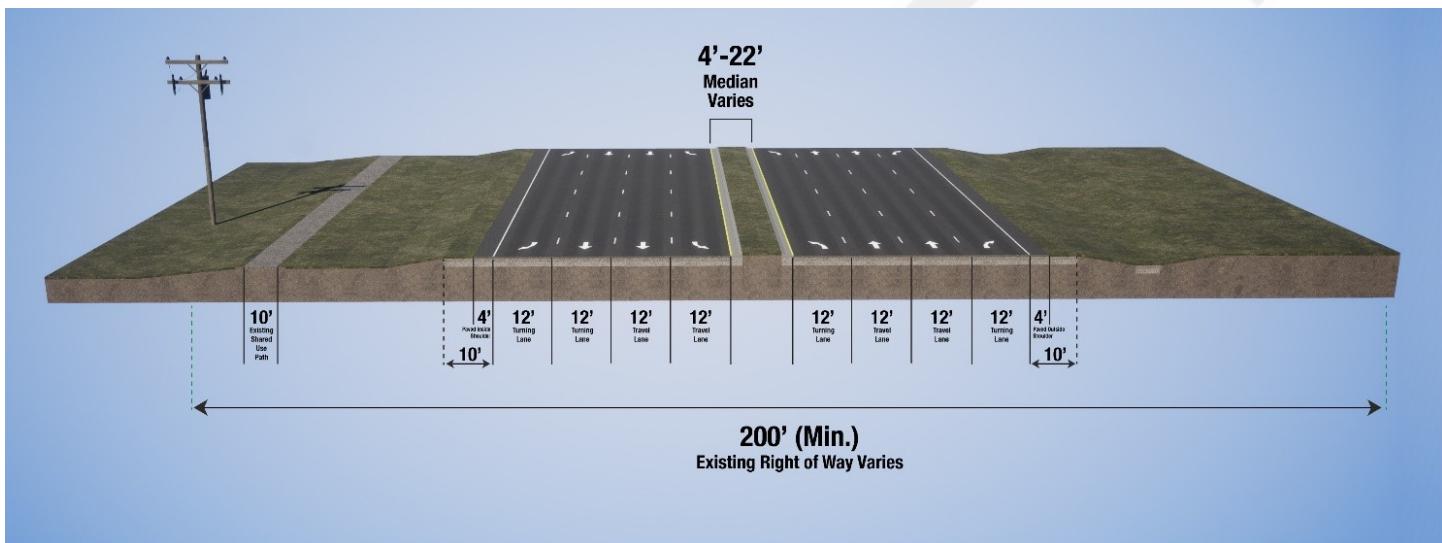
Existing S.R. 70 Roadway Typical Section from west of S.R. 31 to west of SE Townsend Avenue
